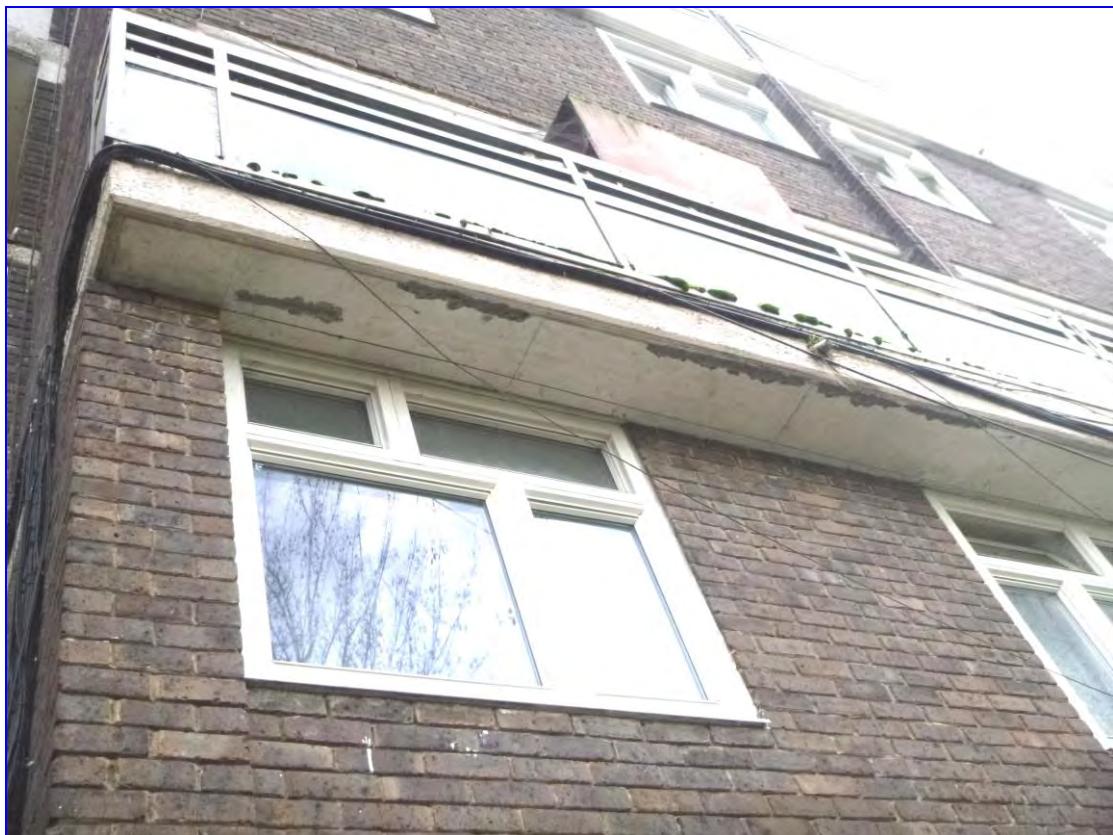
Another example of spalling on Kentmere House. Also note deteriorated paint coatings to soffit.
